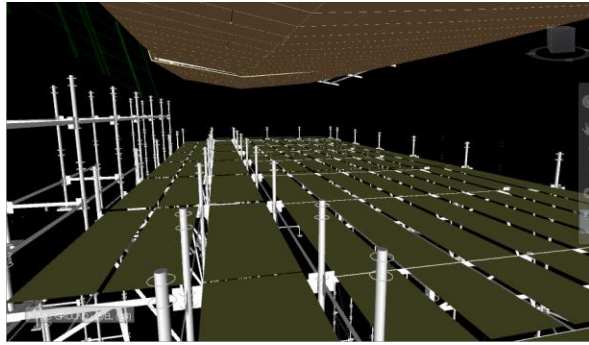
View from on top of the scaffolding where wood panels will be installed. Framing west of the skylight is started
